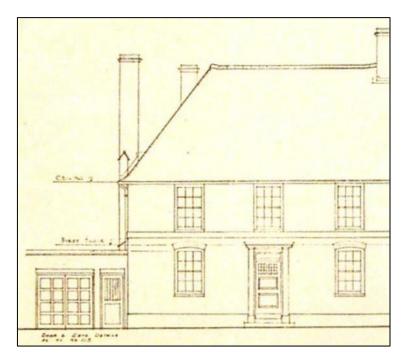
1948 front elevation of Willifield Way (Hampstead Garden Suburb Trust)
